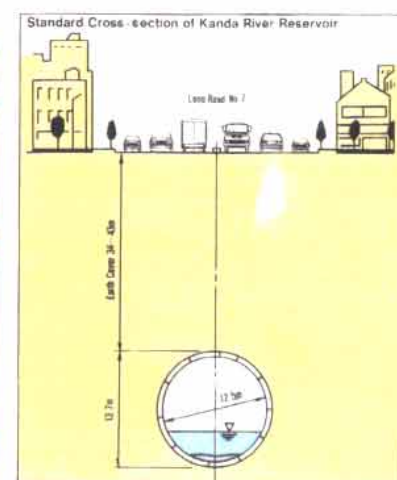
Standard Cross Section of Underground River beneath Loop Road No. 7
